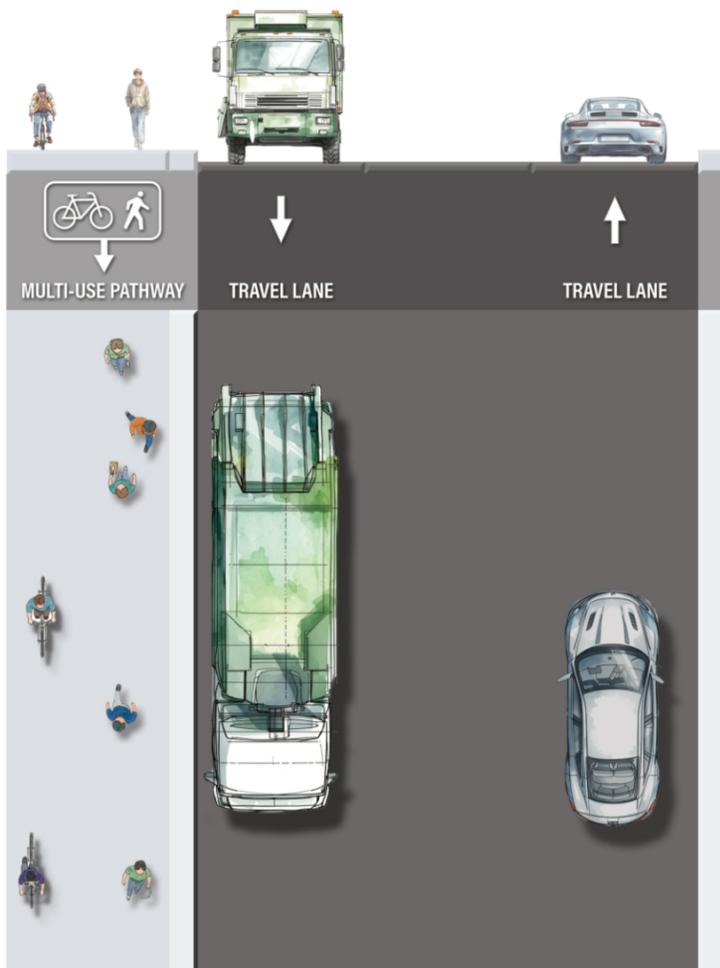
Shared Oak Street Section/Plan view, 20 m width
